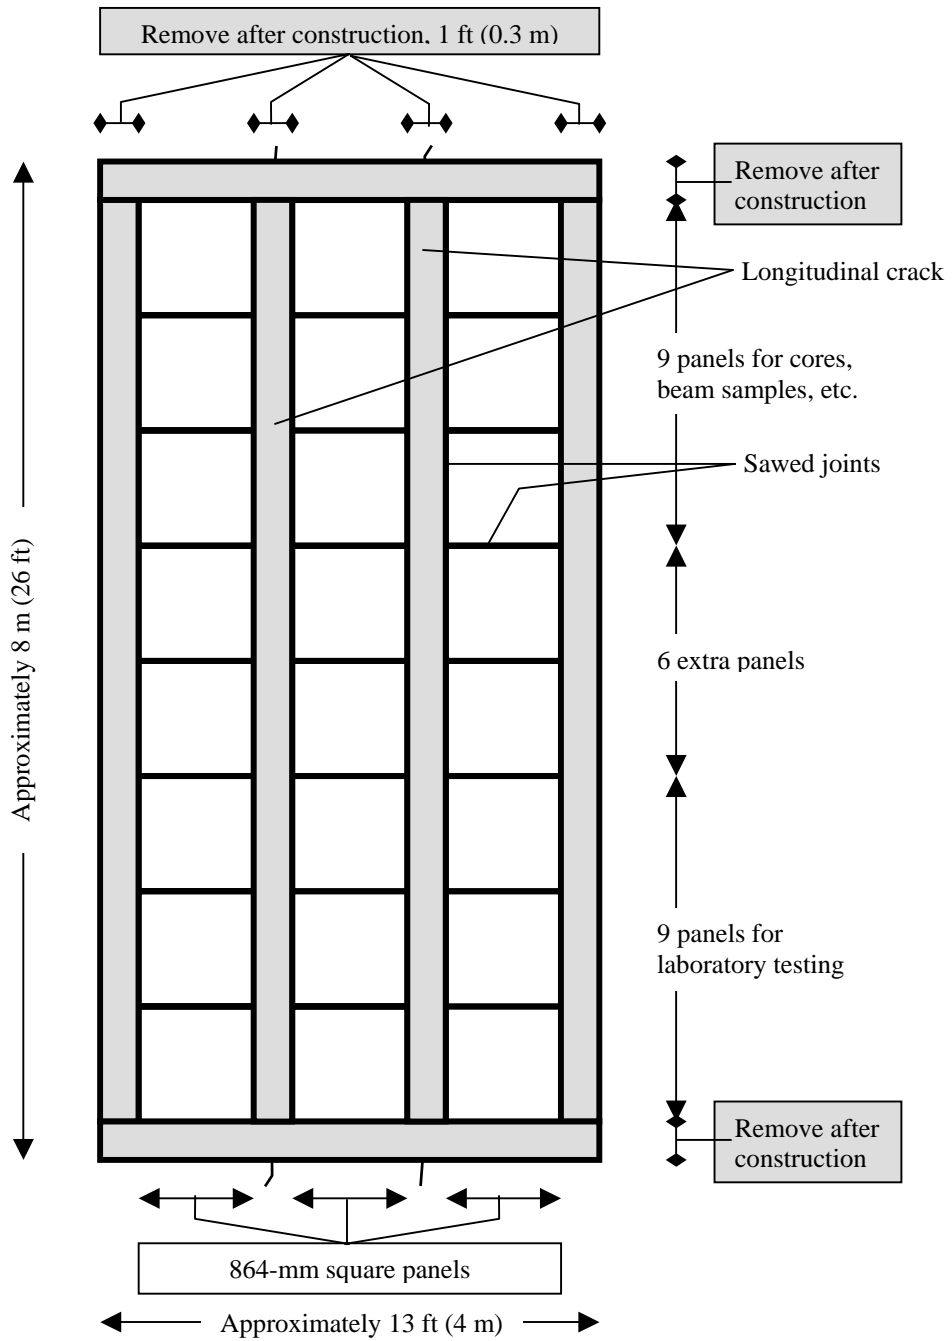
Test sample layout avoided longitudinal cracks in AC pavement.
